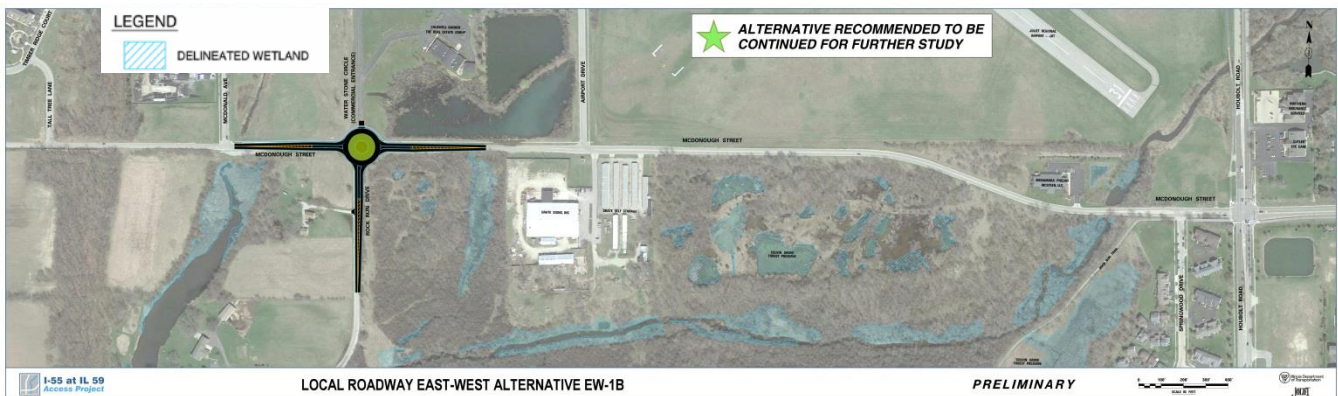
East-West Connector Alternative EW-1B Concept Plan
